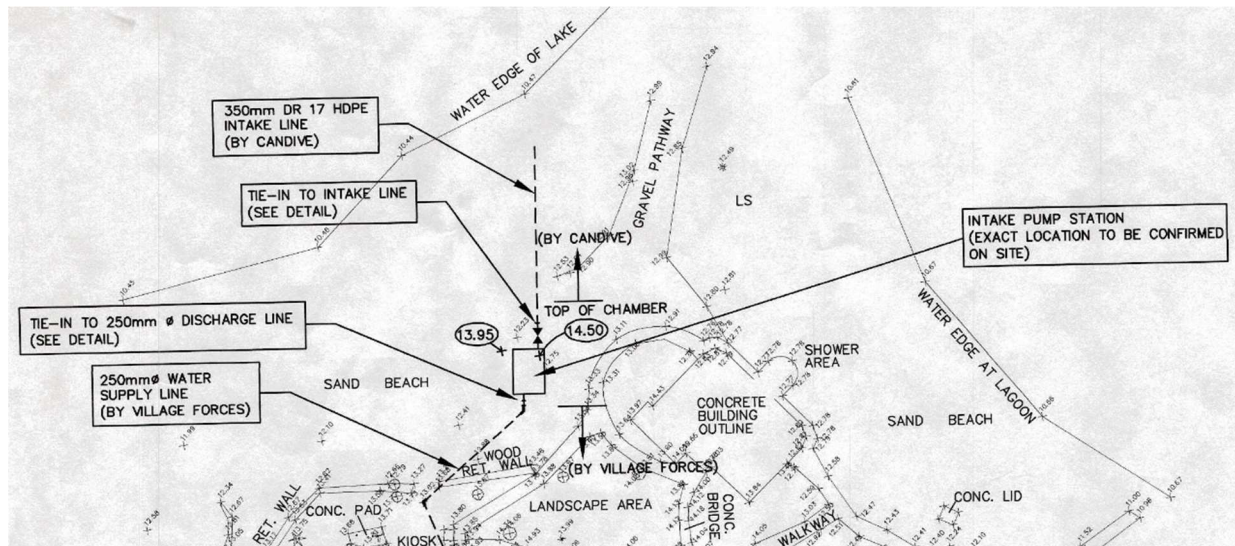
Elevations around the Lake Pumphouse Station (Paragon Engineering, 2000)
